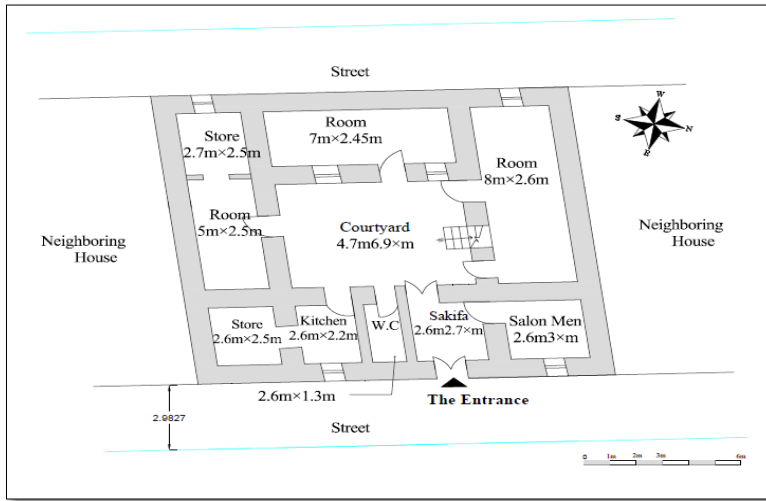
Ground floor plan of Mahmoud Sola house in Tripoli.
